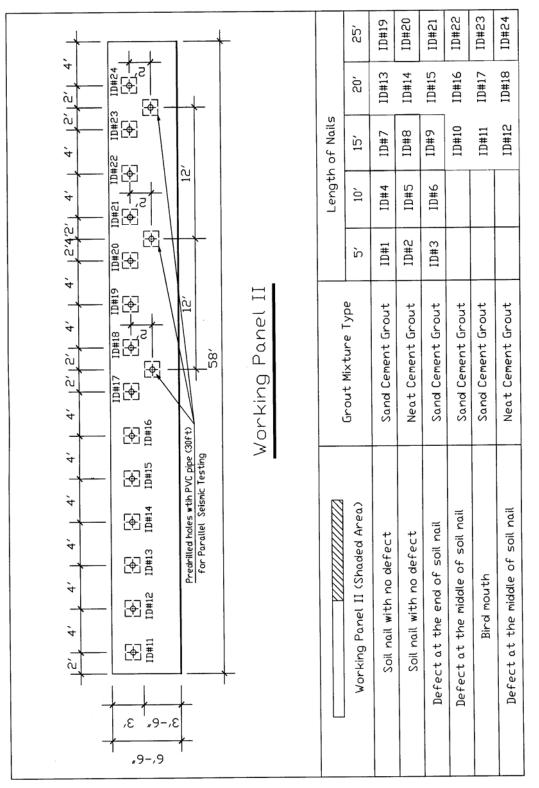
Working Panel II in Phase 1 Wall Construction
